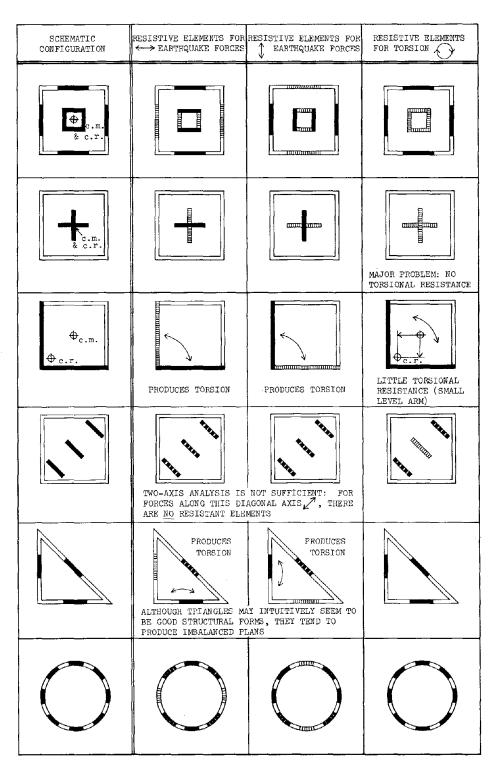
Shear wall location. Schematic plans can be conceived of as collections of resistant elements with varying orientations (to resist translation) and with varying distances from the center of rigidity (to resist rotation, or torsion). Braced frames act in the same manner as shear walls, though they may be of lower resistance depending on their detailed design. Bracing generally takes the form of steel rolled sections, circular bar sections, or tubes; vibrating forces may cause it to elongate or compress, in which case it loses its effectiveness and permits large deformations or collapse of the vertical structure (Figure III-31). Inelastic behavior must be designed into the bracing to create a safe assembly.
